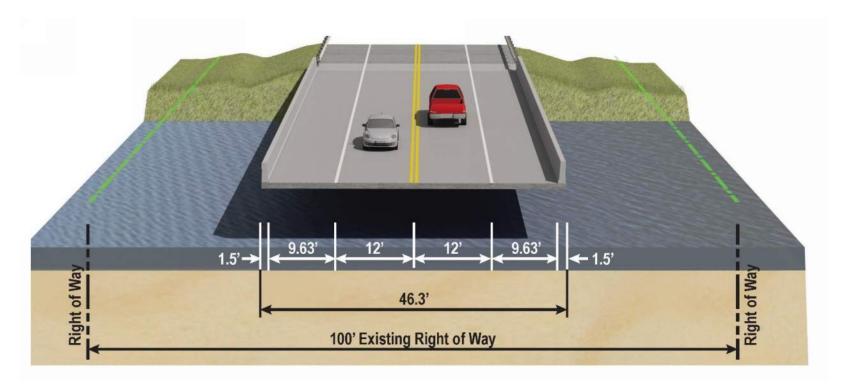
Existing Bridge Typical Section – Lake Hamilton Canal
